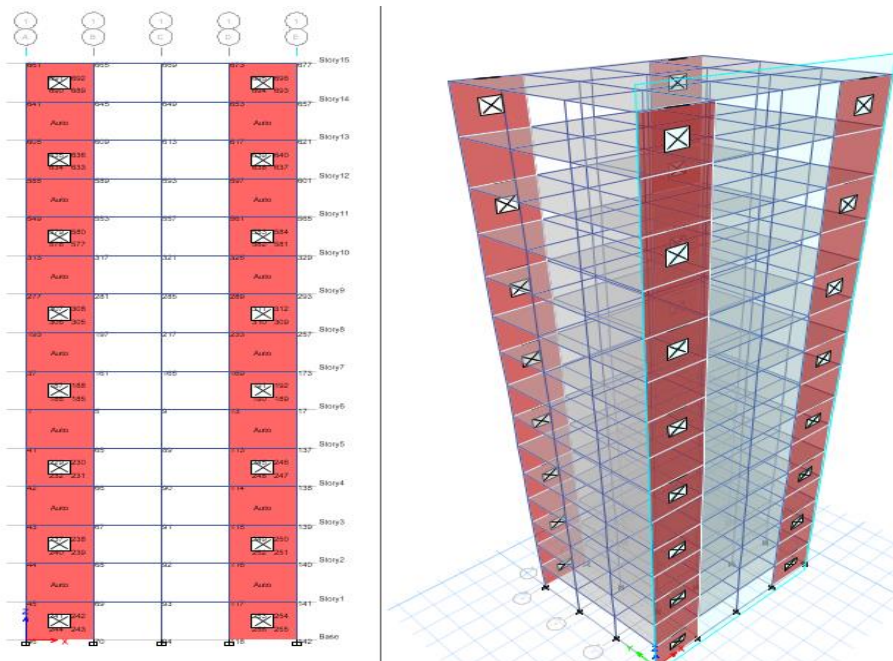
The 15-story building with concrete shear wall and with openings in the odd stories.
